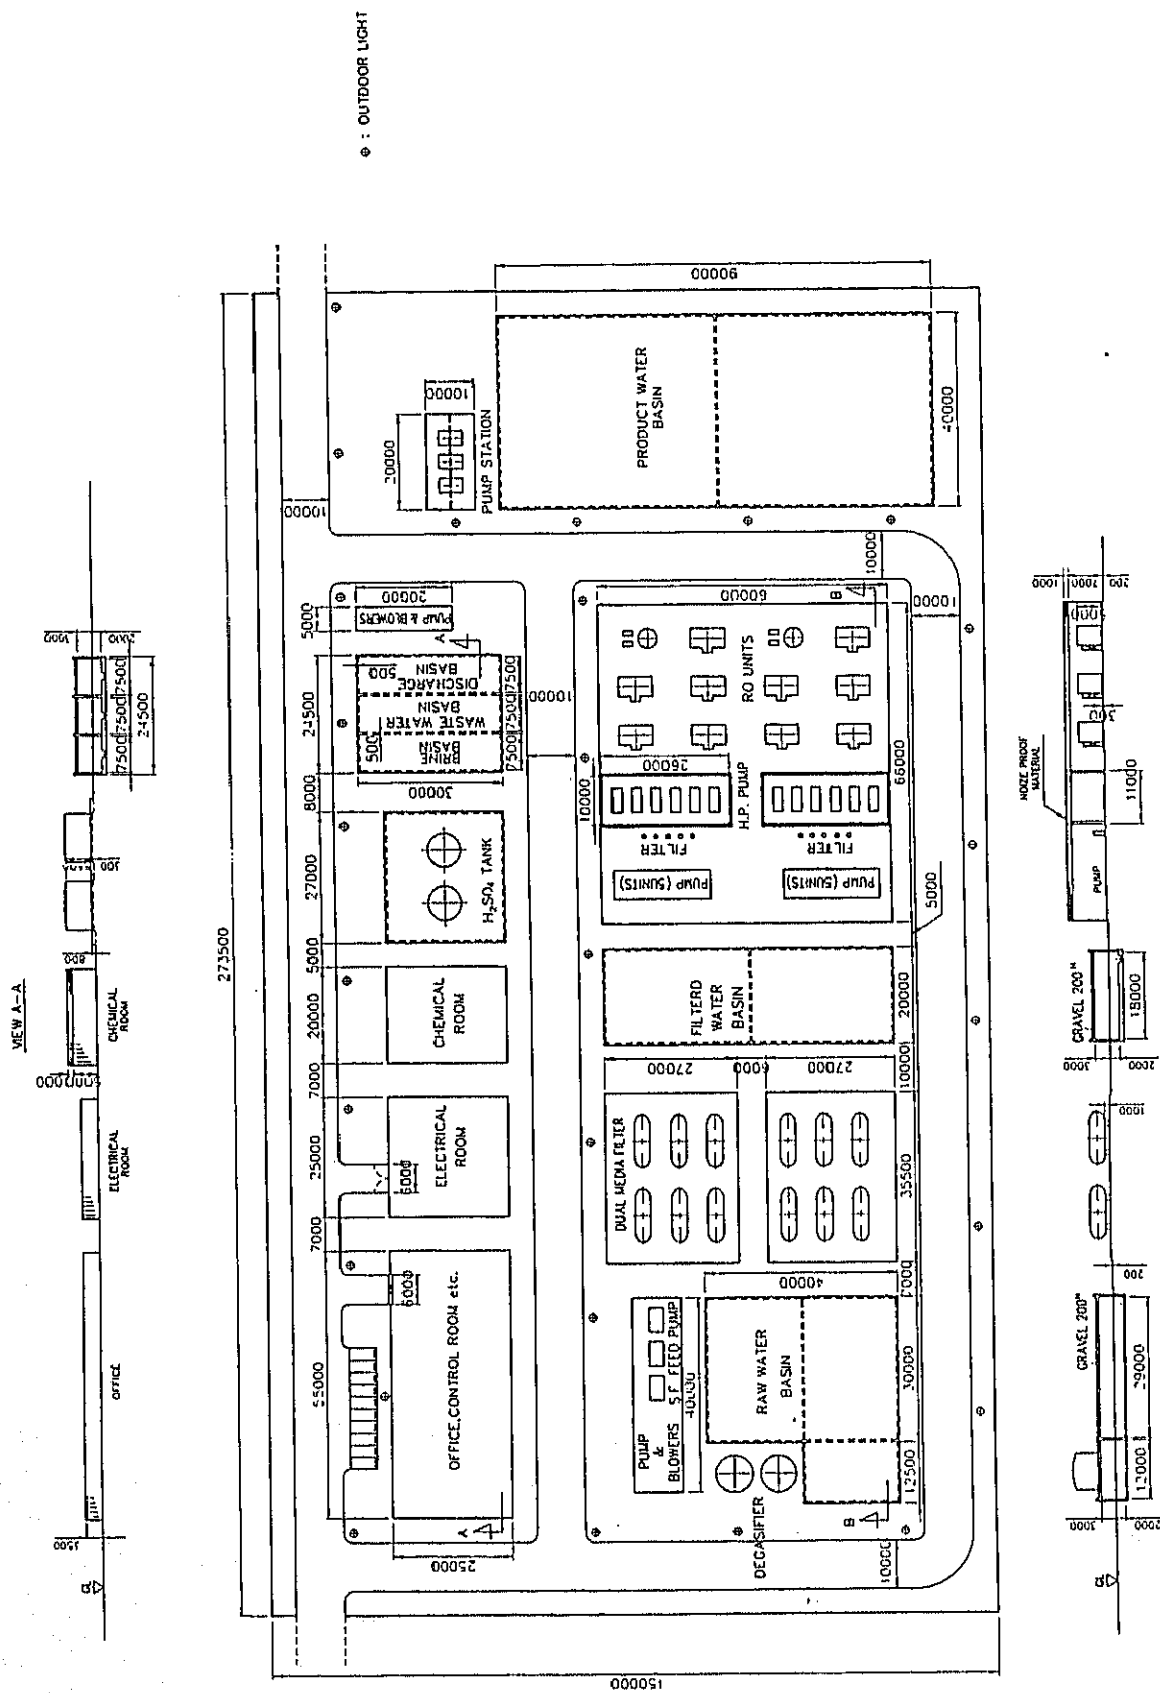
Layout of Desalination Plant (Plan A)
